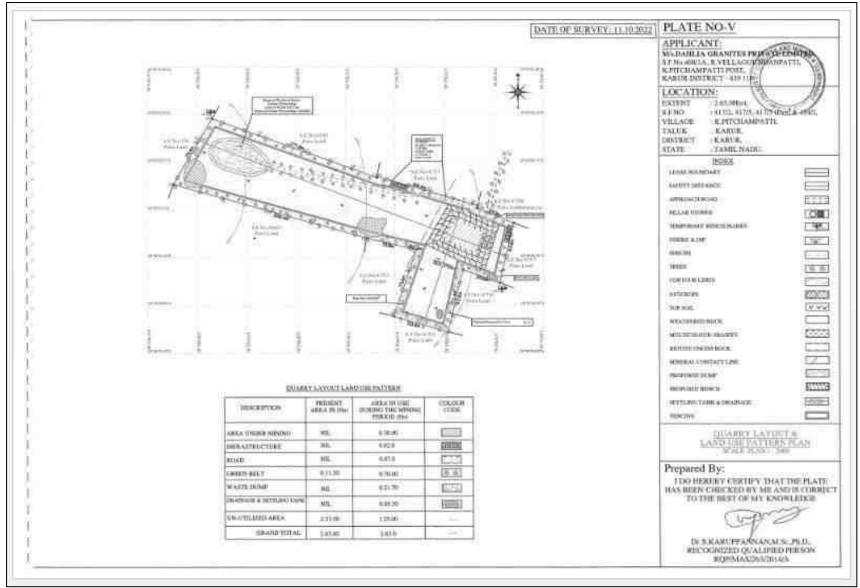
Quarry Layout & Land Use Pattern Plan
